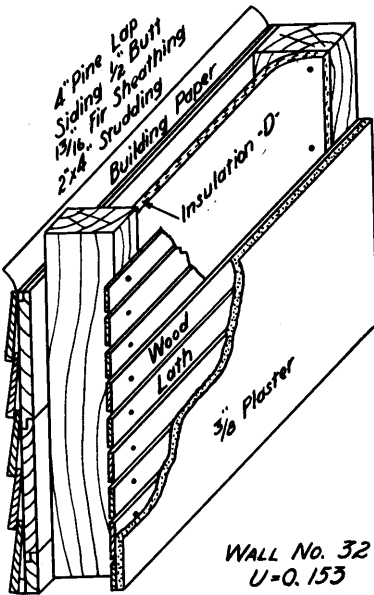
SECTIONAL VIEWS OF TEST WALLS
